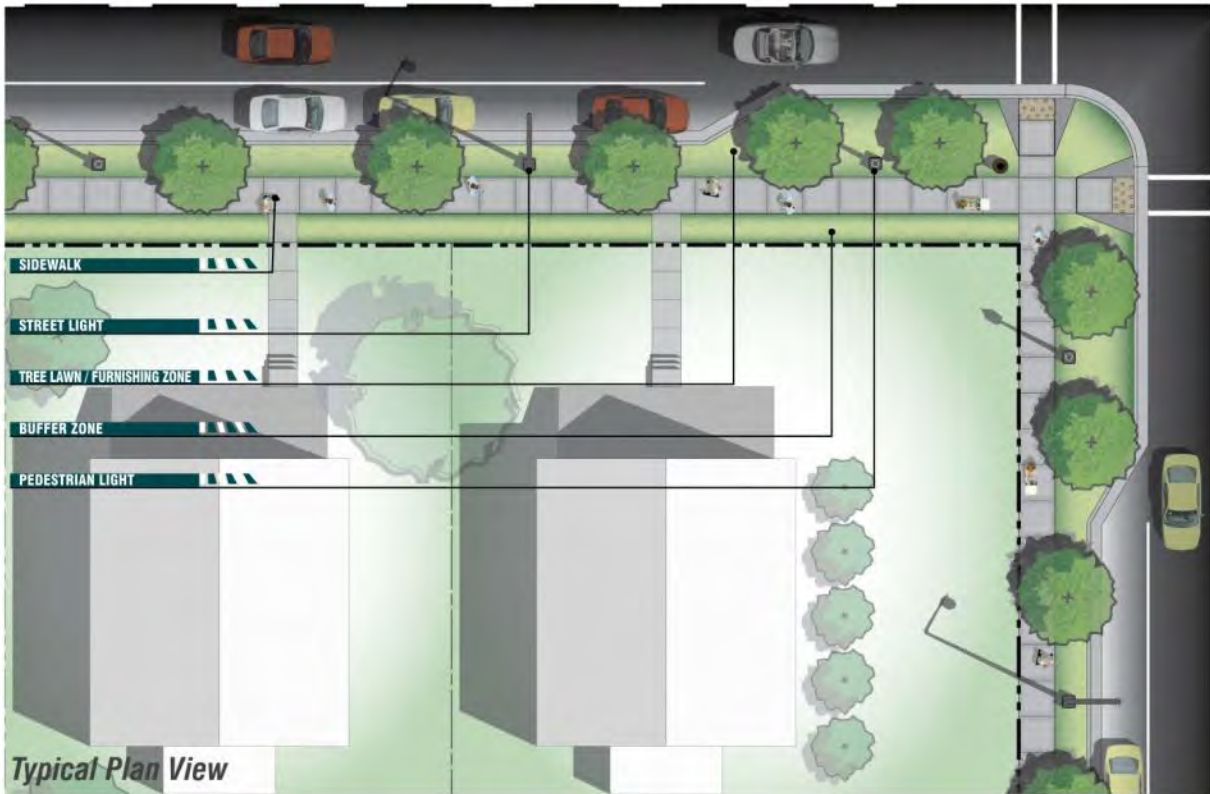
Recommended Streetscape Design – Bump Out at Residential Intersection
